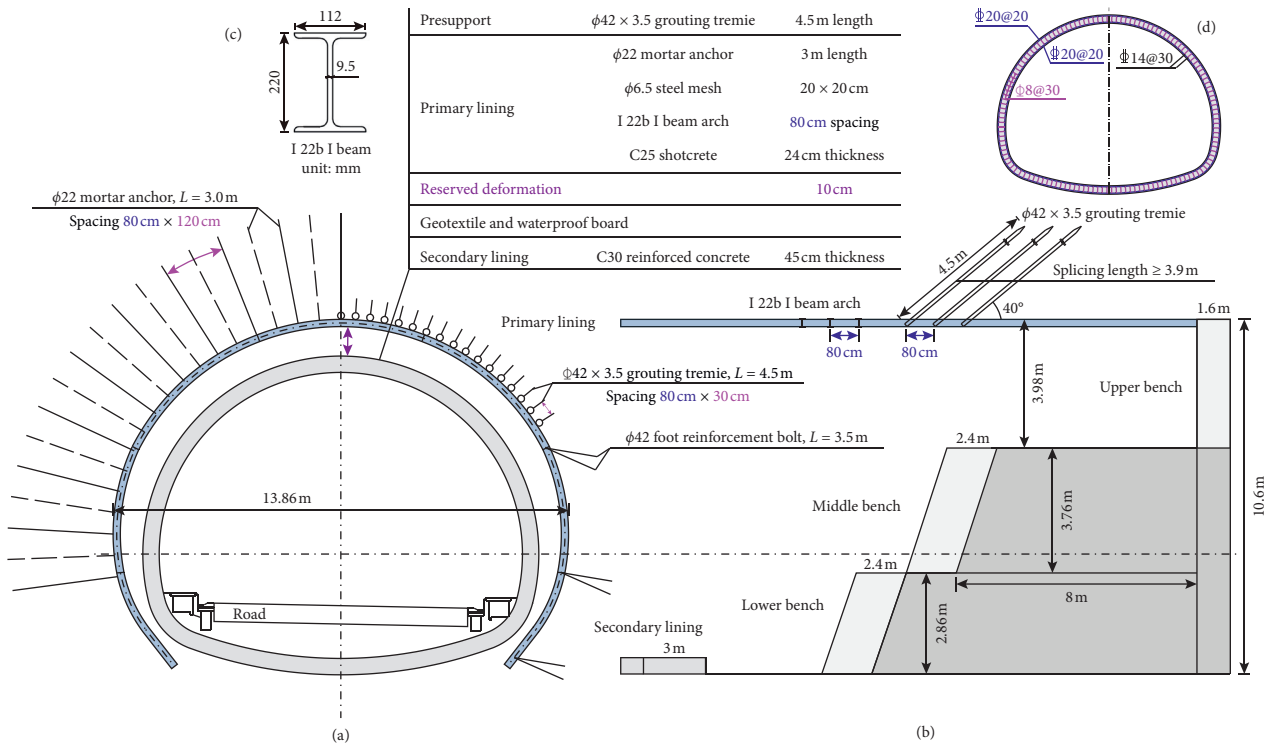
Schematic diagram of construction design for supporting system: (a) cross section; (b) longitudinal section; (c) geometrical information of I 22b I beam; (d) reinforcement design of the secondary lining.
